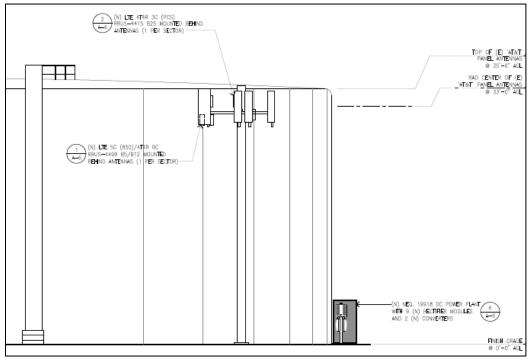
Elevation view of proposed modifications in Sector C (Source: Plans, page A-5, panel 2).
